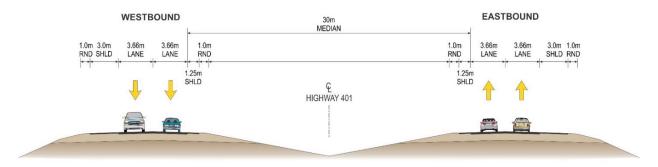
Typical Existing Highway 401 Open Median Cross-Section
